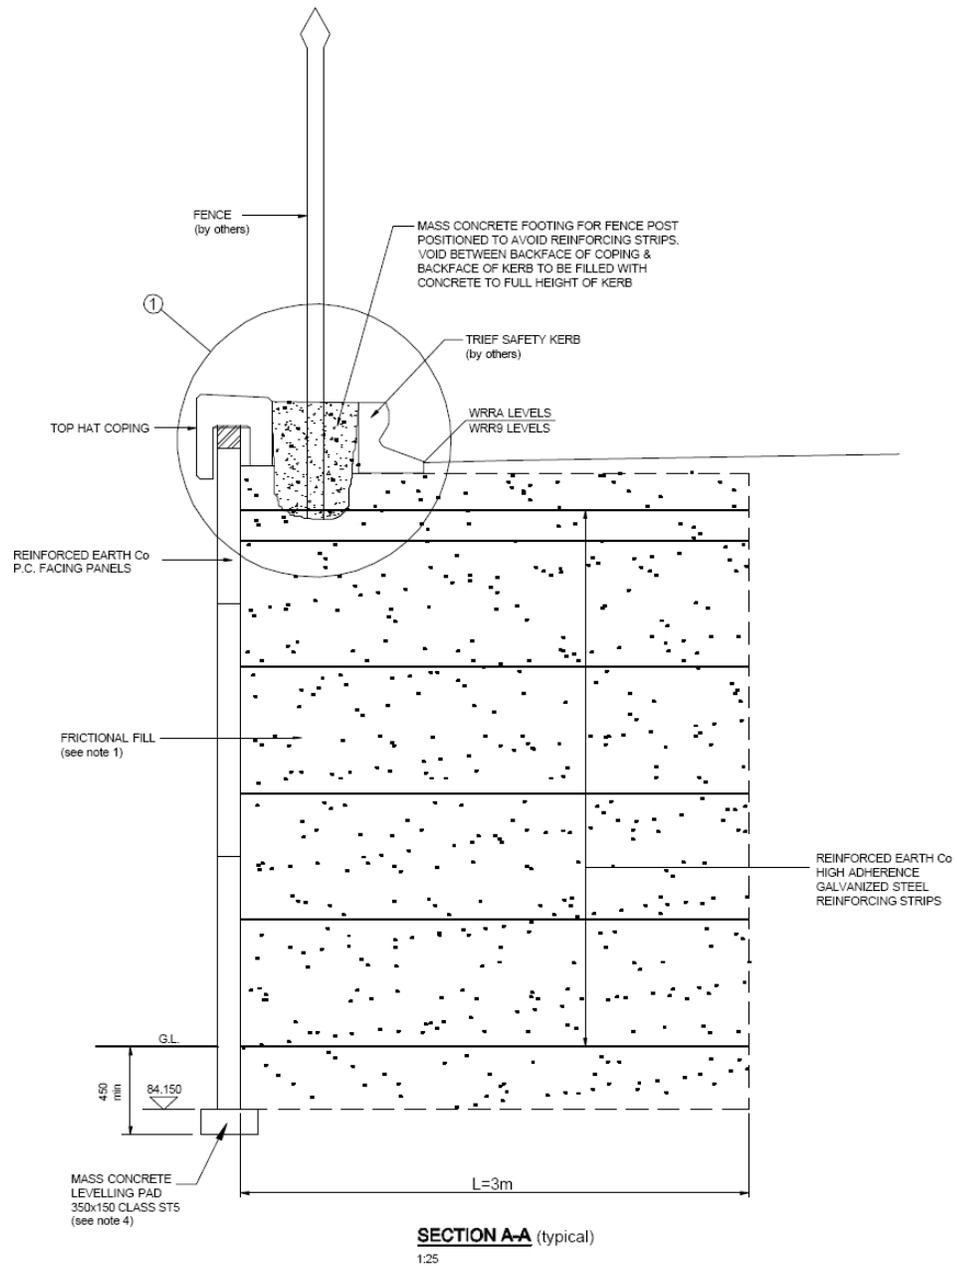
Example of Concrete Panel Wall with steel strips reinforcement used at Hunters Lane
